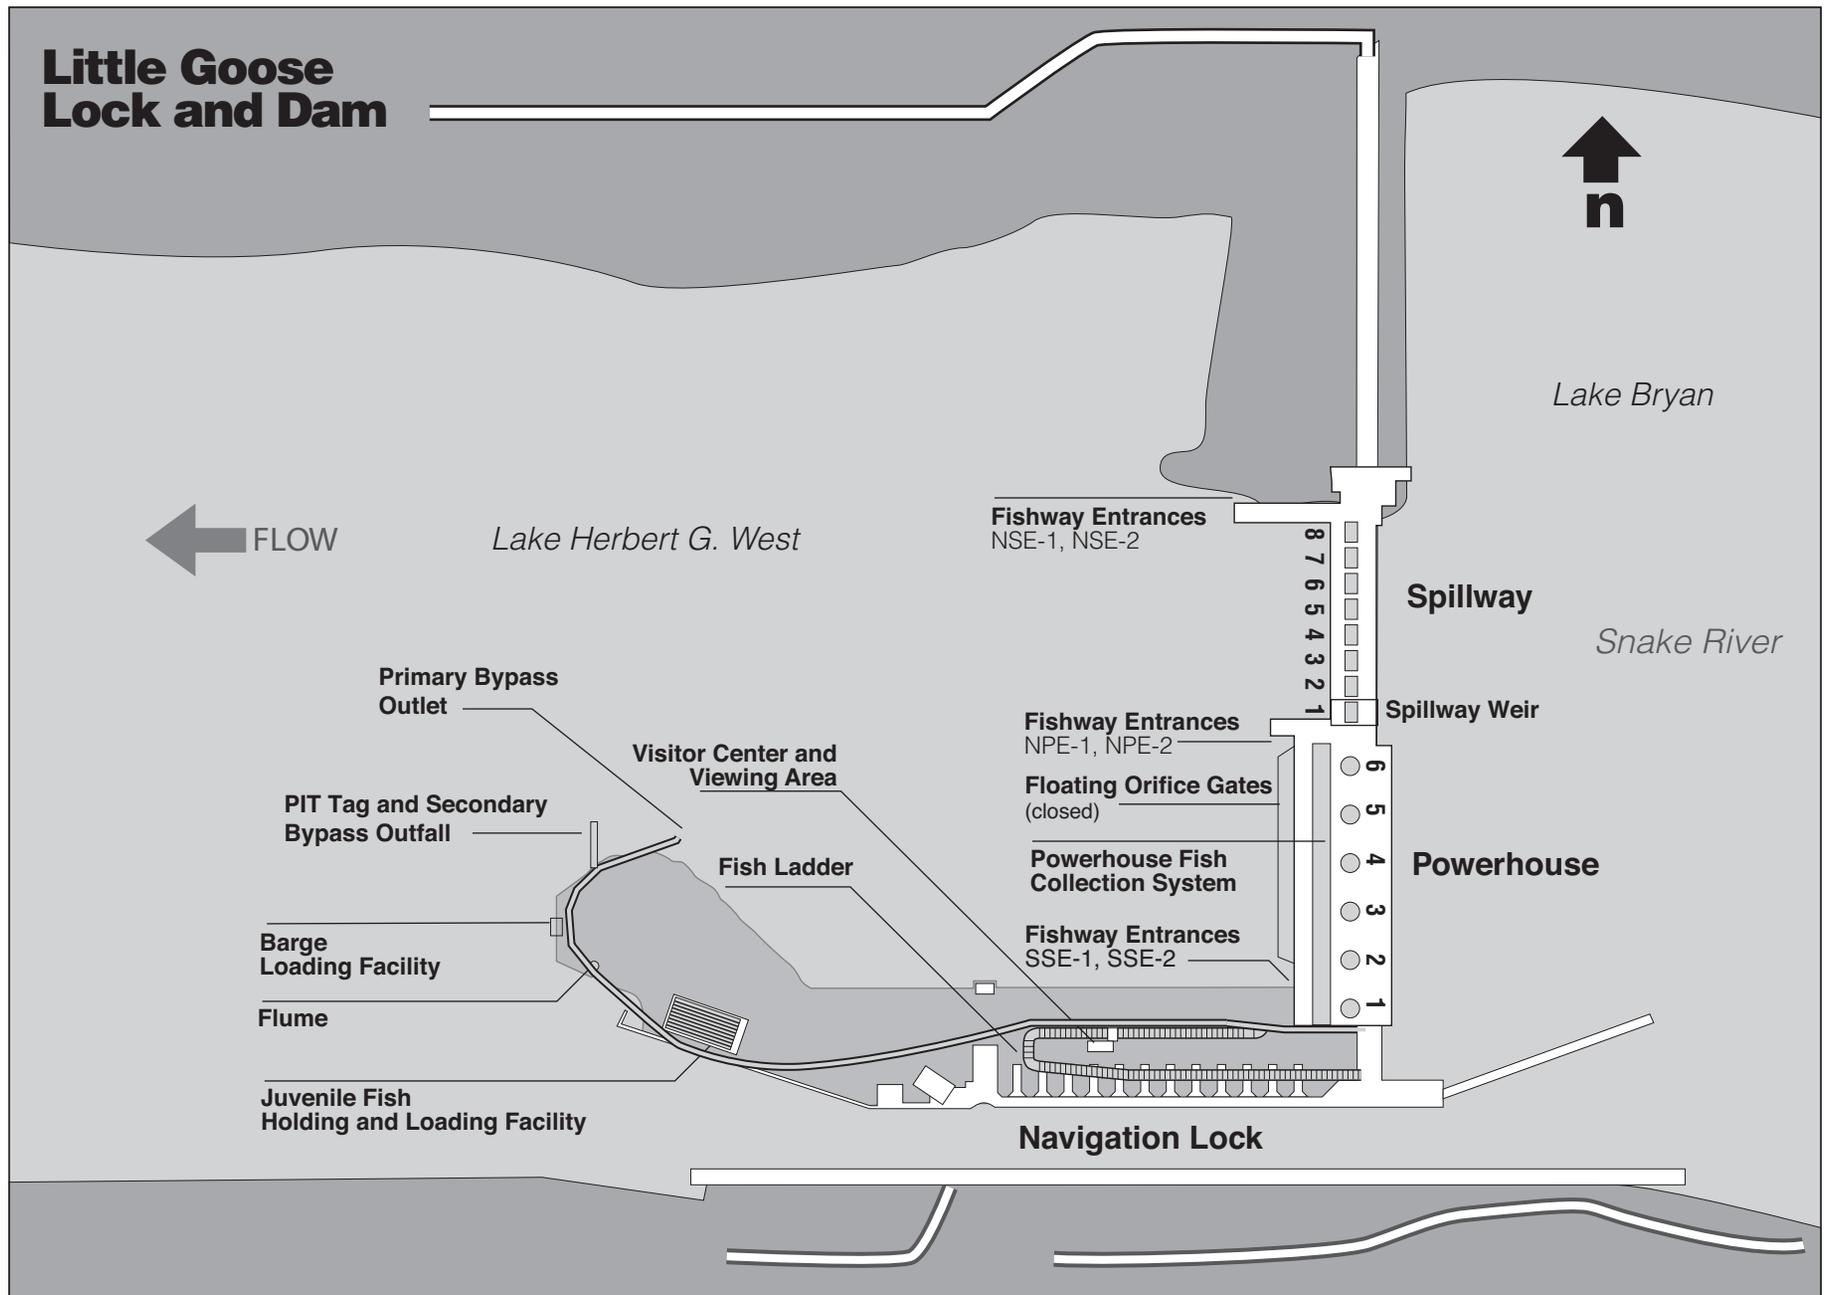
Little Goose Lock and Dam General Site Plan
